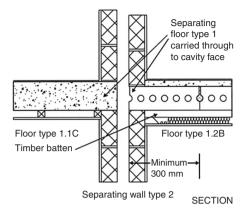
Floor types 1.1C and 1.2B - wall type 2
